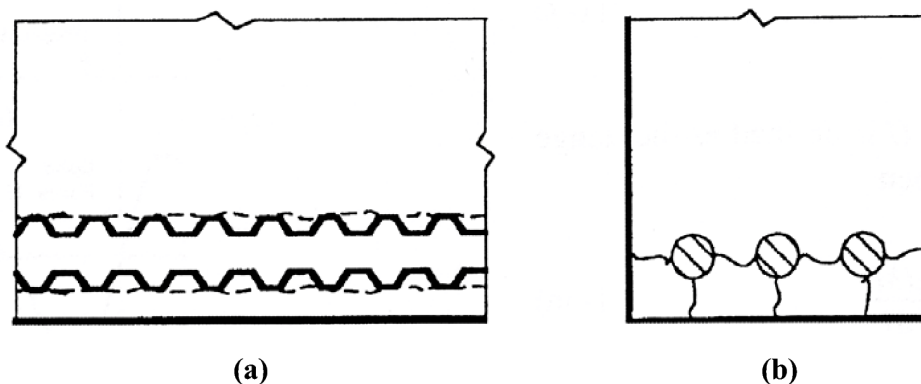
Cracking and damage mechanisms in bond: (a) End view showing splitting cracks between bars and concrete cover; (b) Side view of member showing shear crack and/or local concrete crushing due to bar pullout. (Source: ACI 408R-03)
